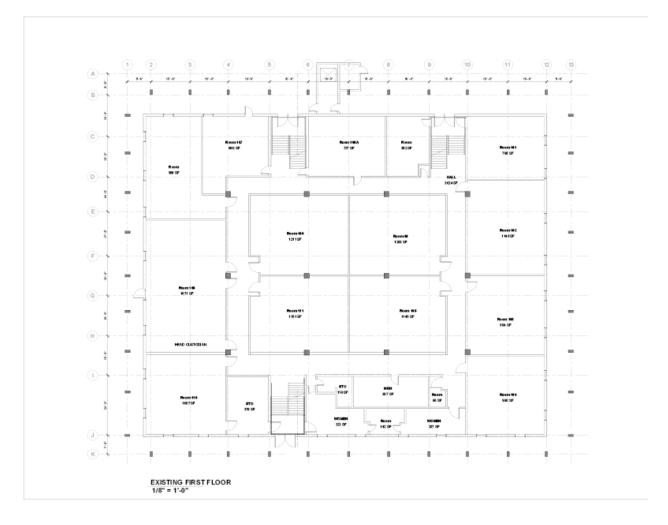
EXISTING FIRST FLOOR PLAN
